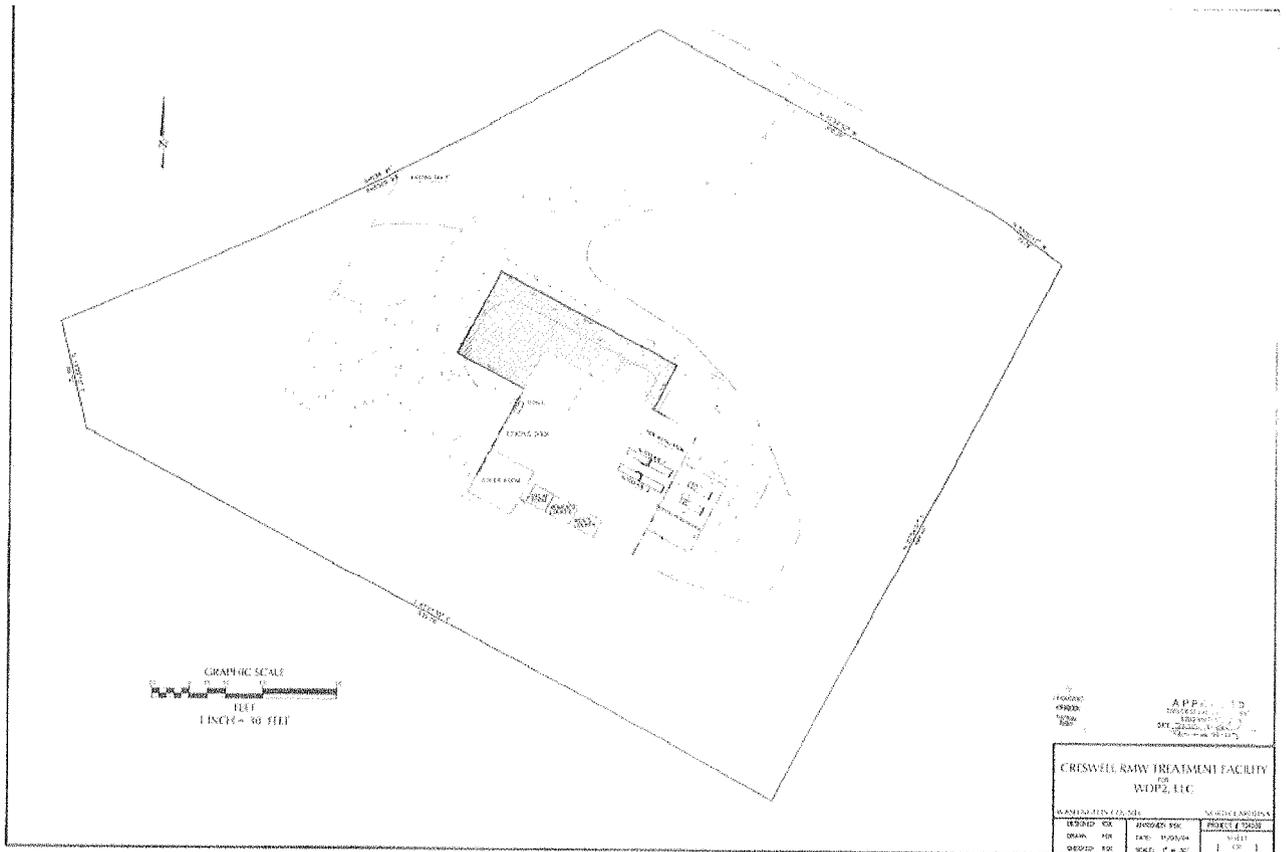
a: Original Site plan of existing facilities as originally permitted
